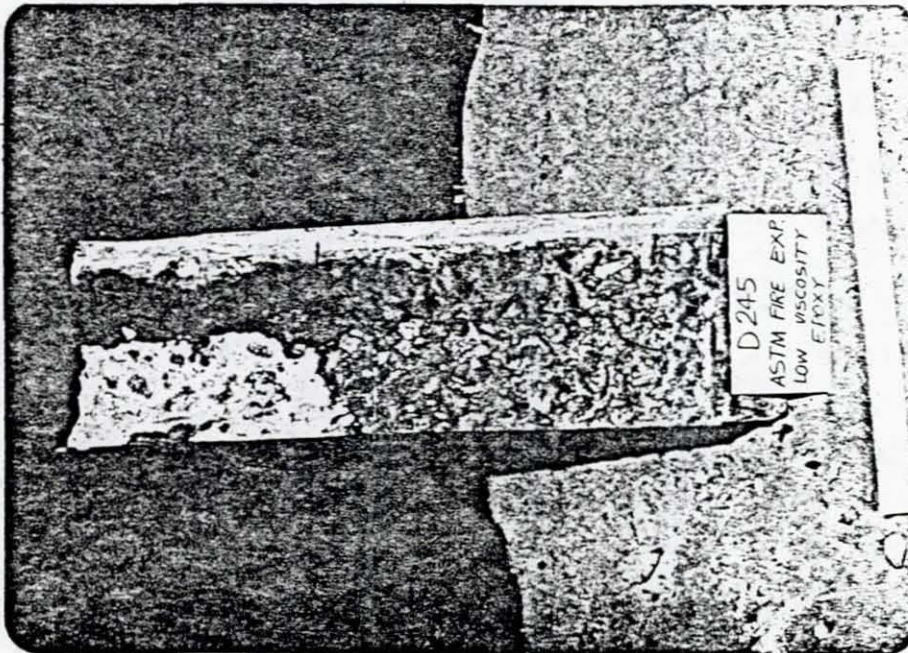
Failure pattern for 6 in. Thick Specimen. Note the Combined Shear failure through Epoxy and Concrete
